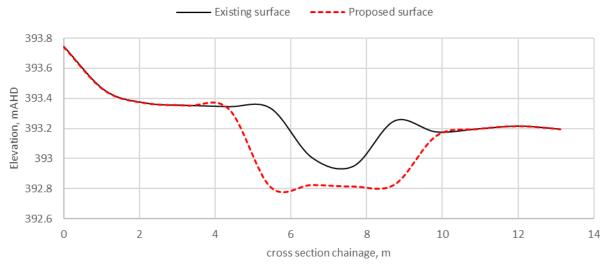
Example cross section of the Daly St existing and proposed channel profile
